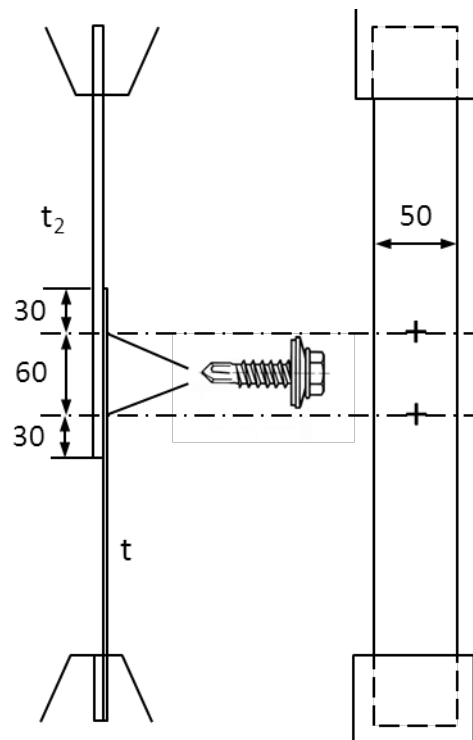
Specimen dimension for screwed connections ($e_1 = 30$ mm, $p_1 = 60$ mm).
